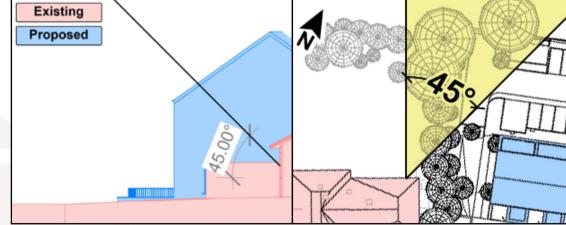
Example section B-B and plan view of closest window of Parc Clies
